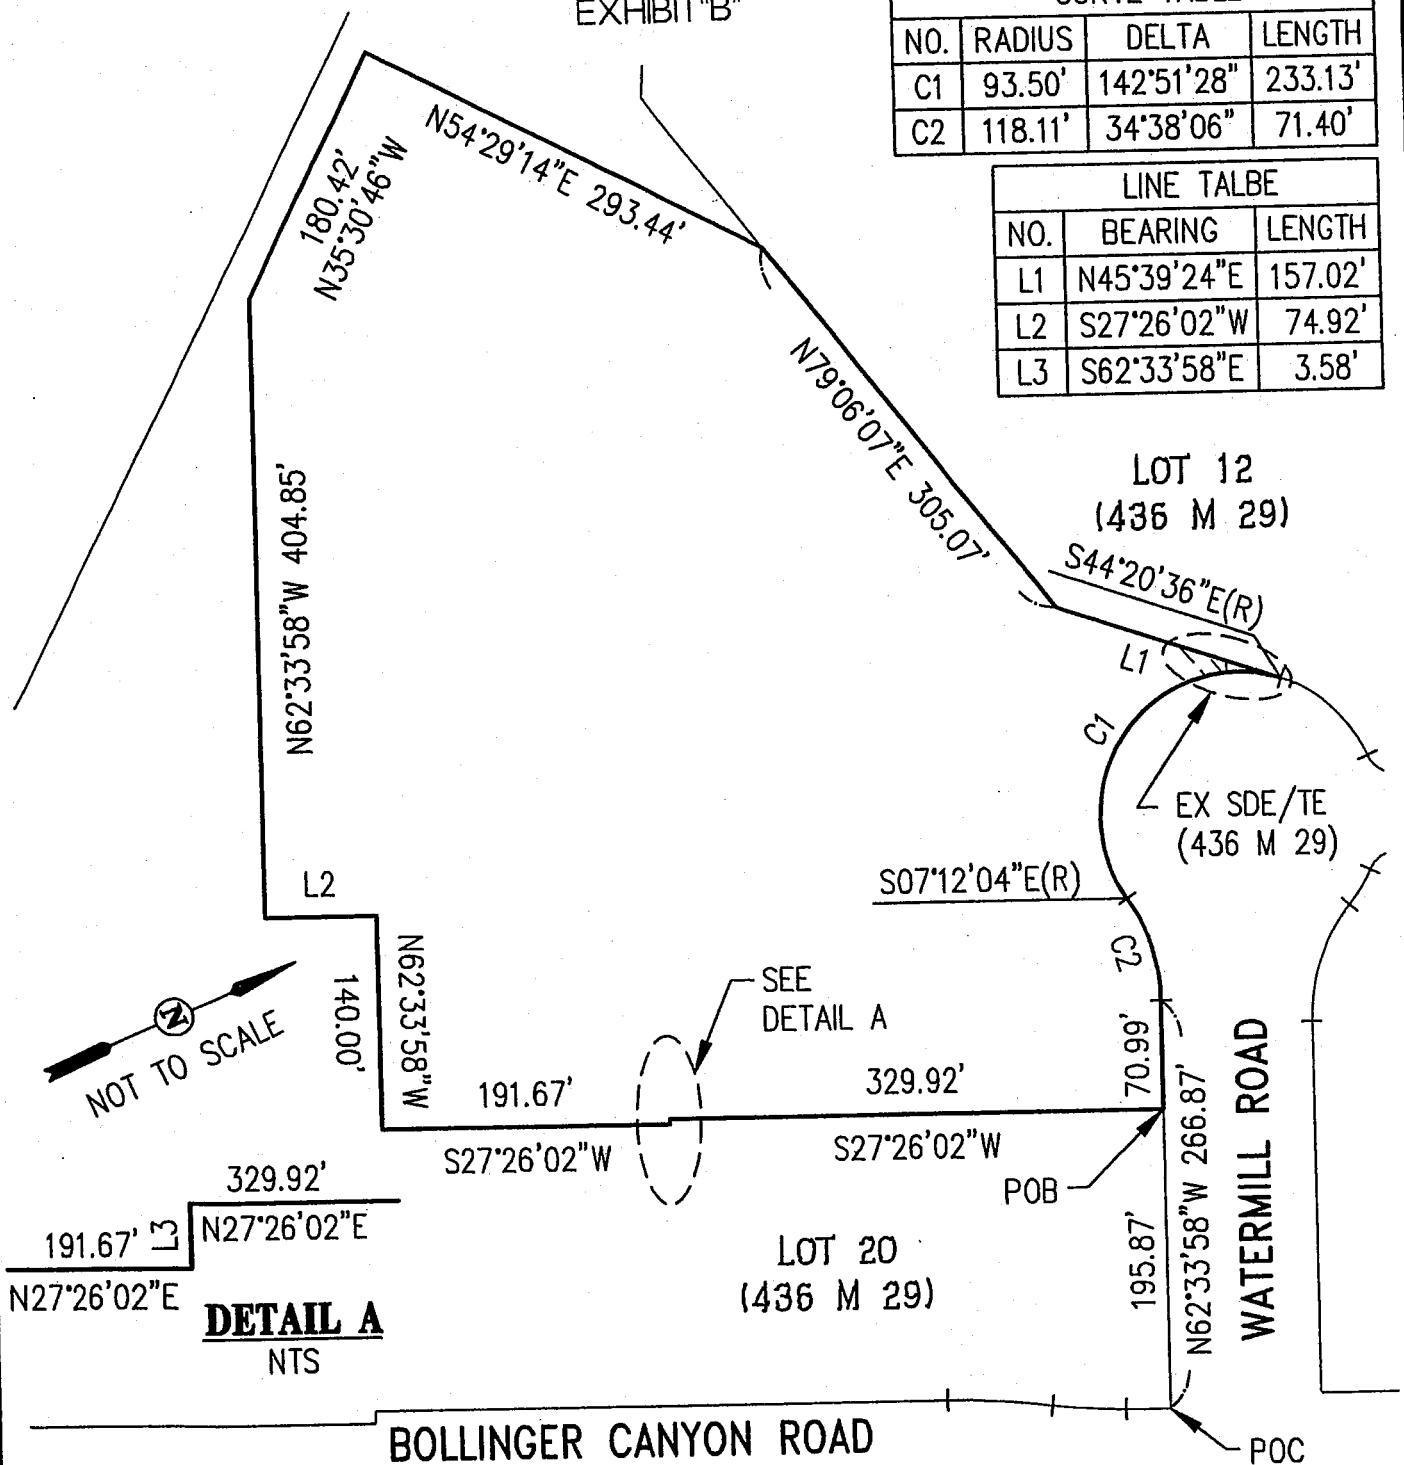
DRIVEWAY & PARKING EASEMENT AREAS
